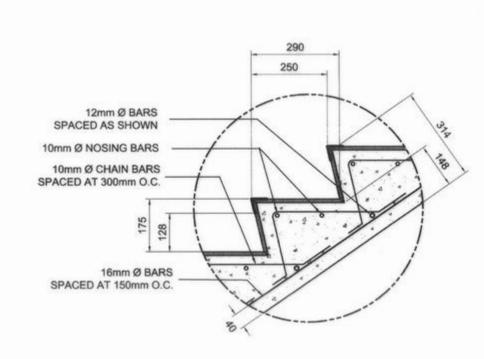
DETAIL - D LAST STAIR THREAD SCALE 1:12.5 MM
